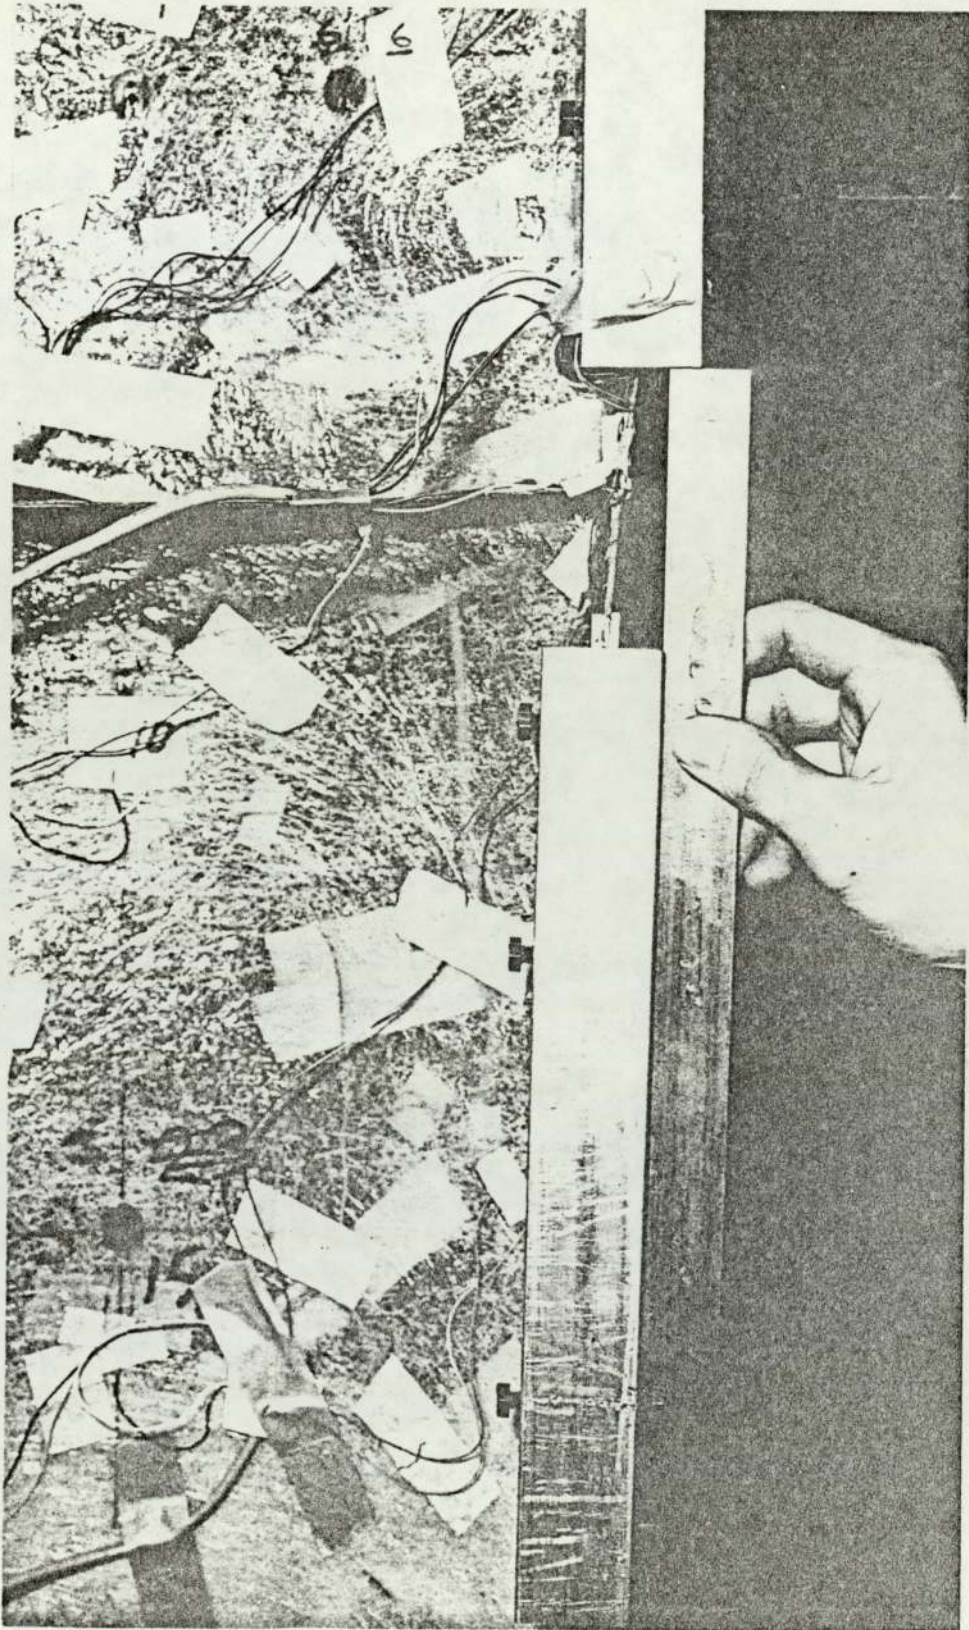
CYLINDRICAL SECTION JOINTS
